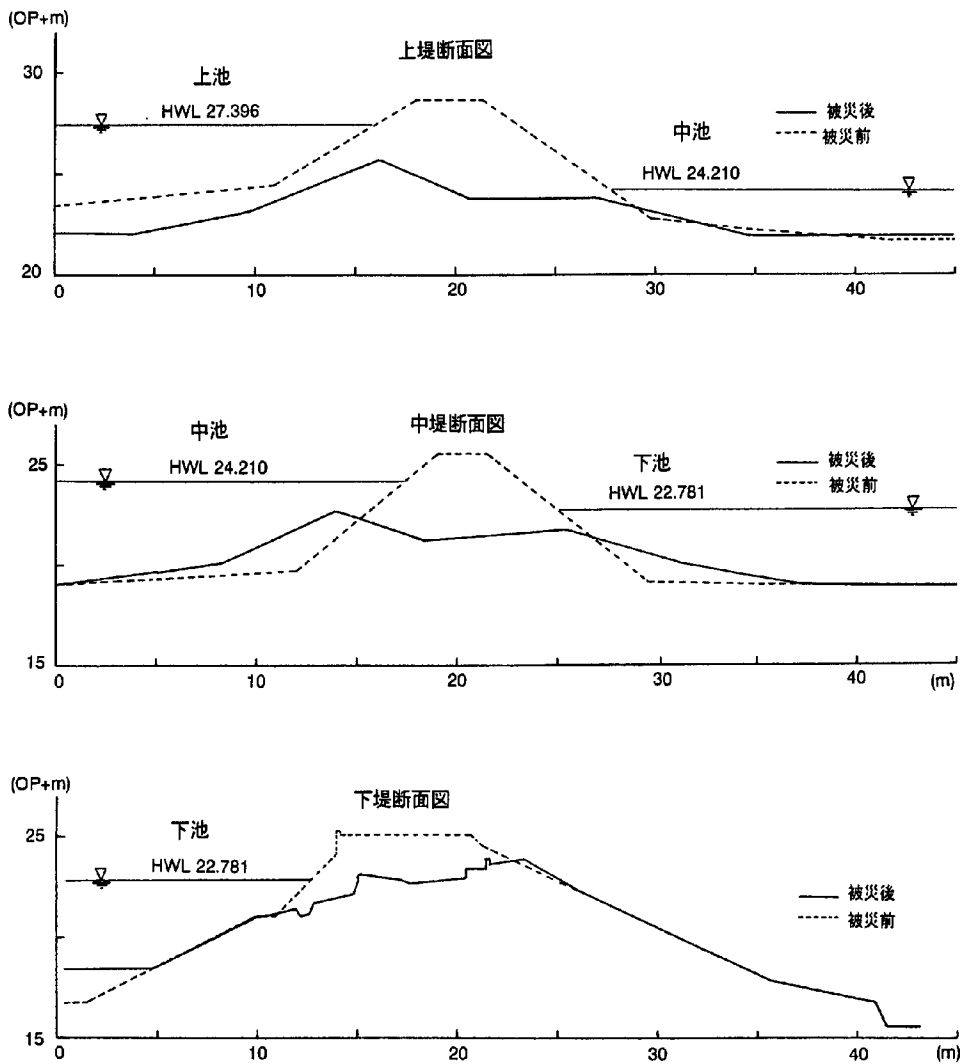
Cross-section of collapsed banks of Niteko reservoir
